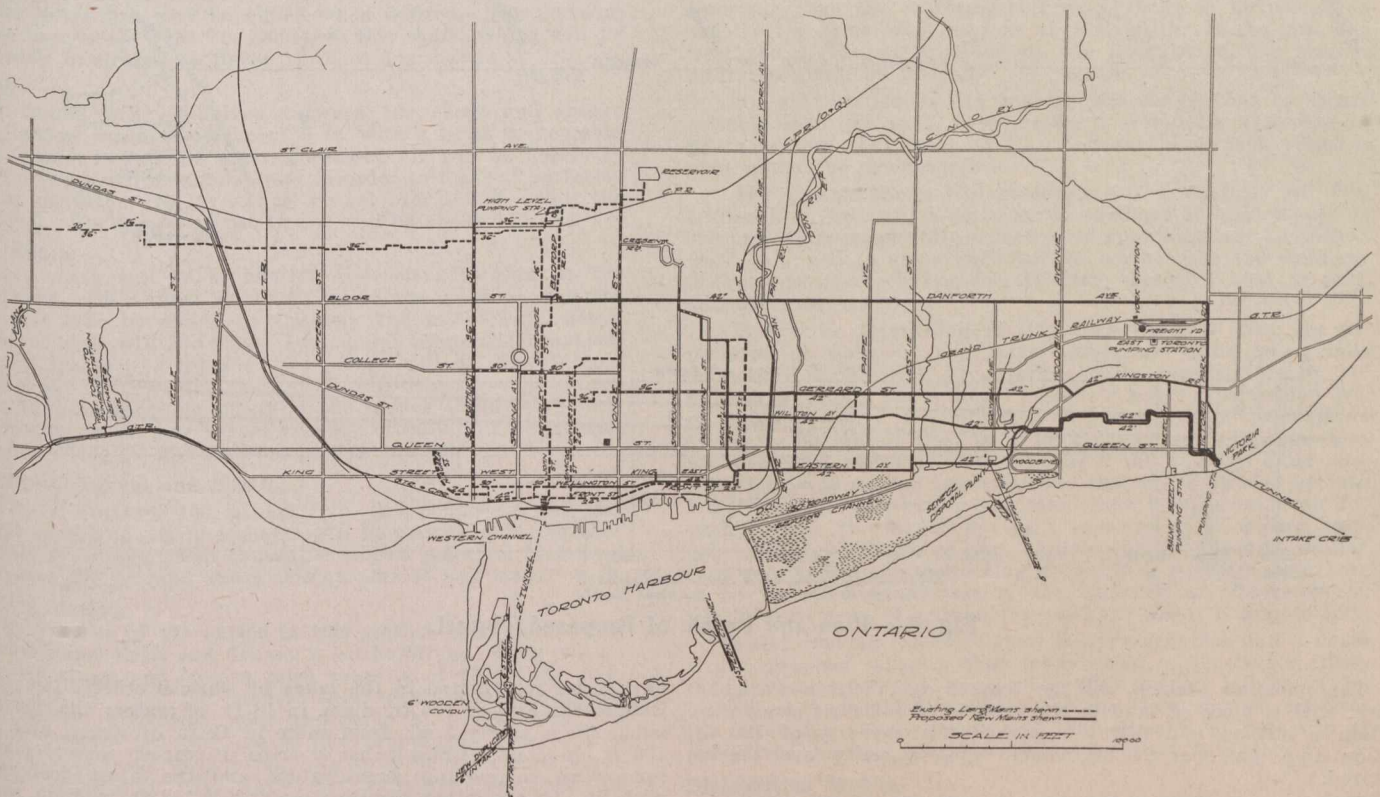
General Plan of Existing and Proposed Water Mains in Toronto.
